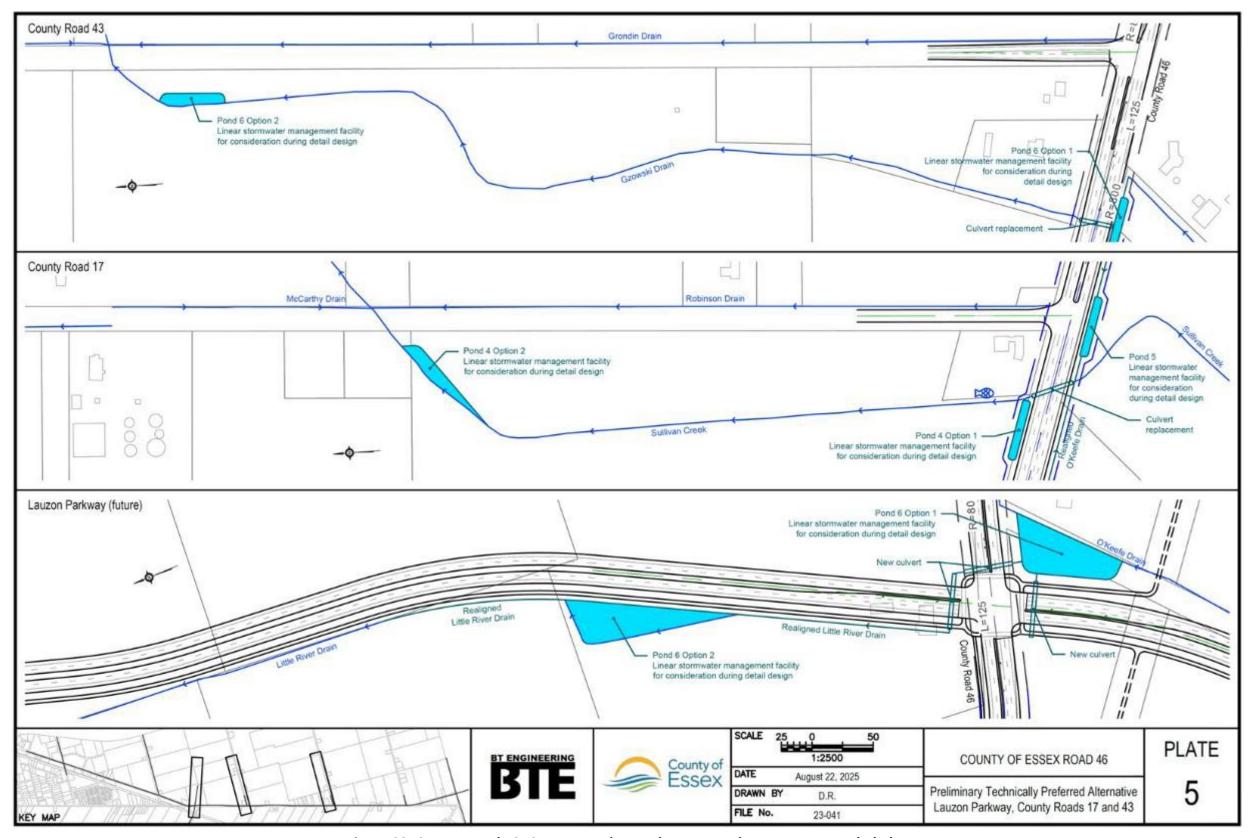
County Road 43, County Road 17 and Lauzon Parkway Recommended Plan
